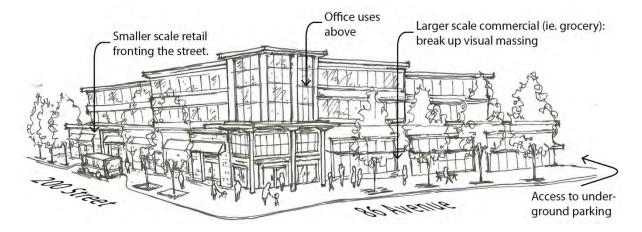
Orient buildings to, and provide direct pedestrian access from, the adjacent public street/sidewalk.
